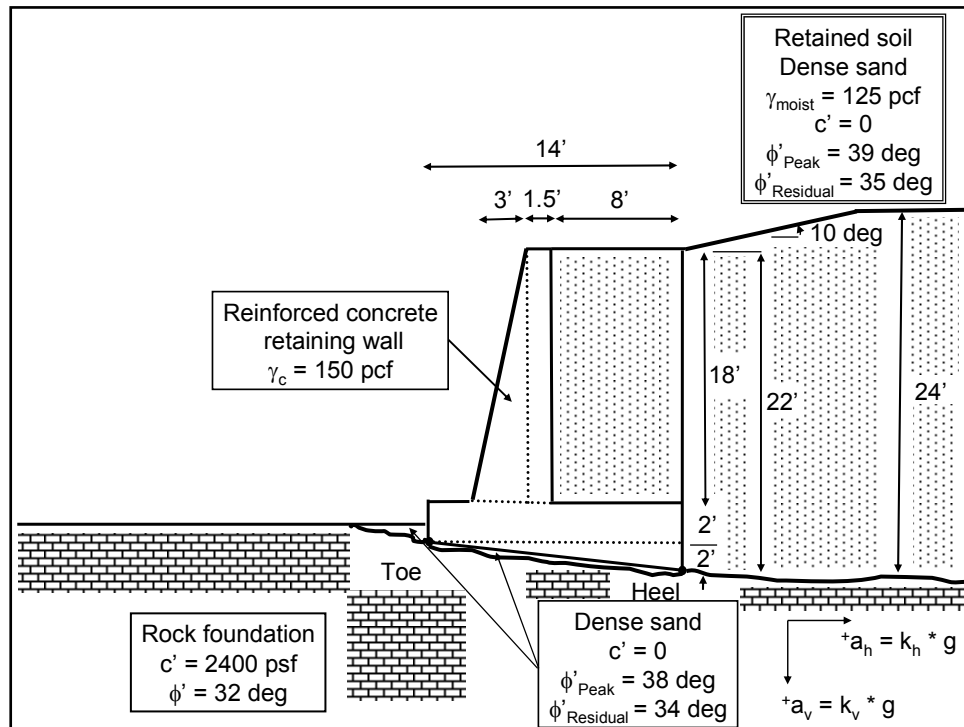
Rock-founded earth retaining wall for Example 1.
